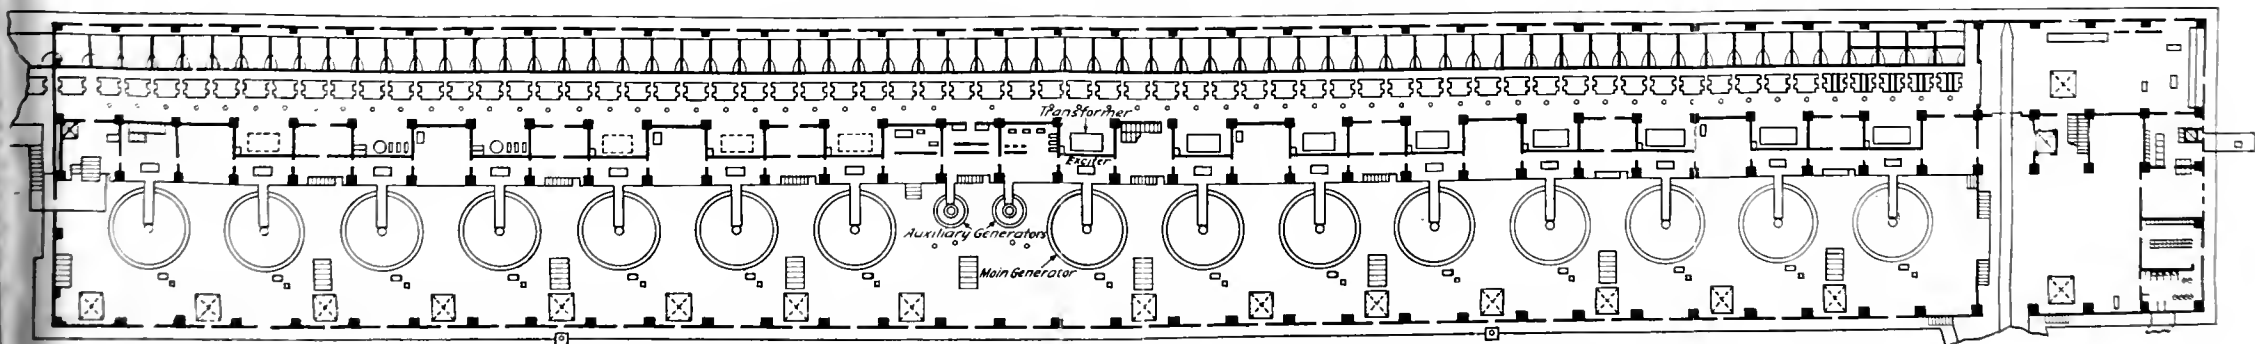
Plan of Generator Floor, and Elevated Floor on which are Mounted the Exciters, Transformers and Gate Mechanisms
